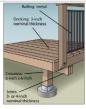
Deck constructed of heavy timber (FEMA, 2008a).
